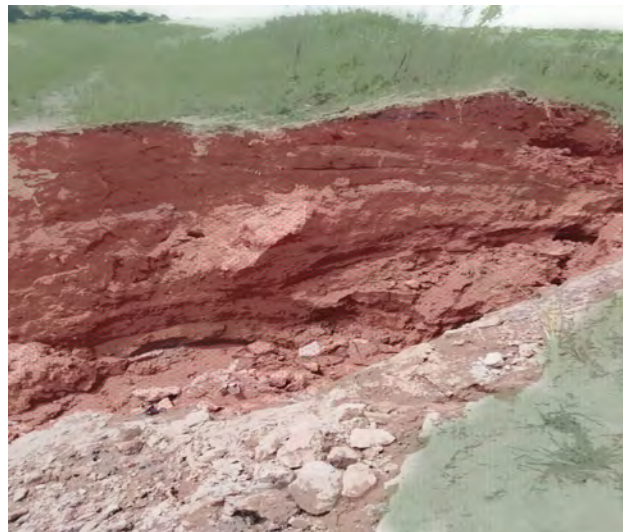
Collapse of banks from ponding (Author, 2020)
